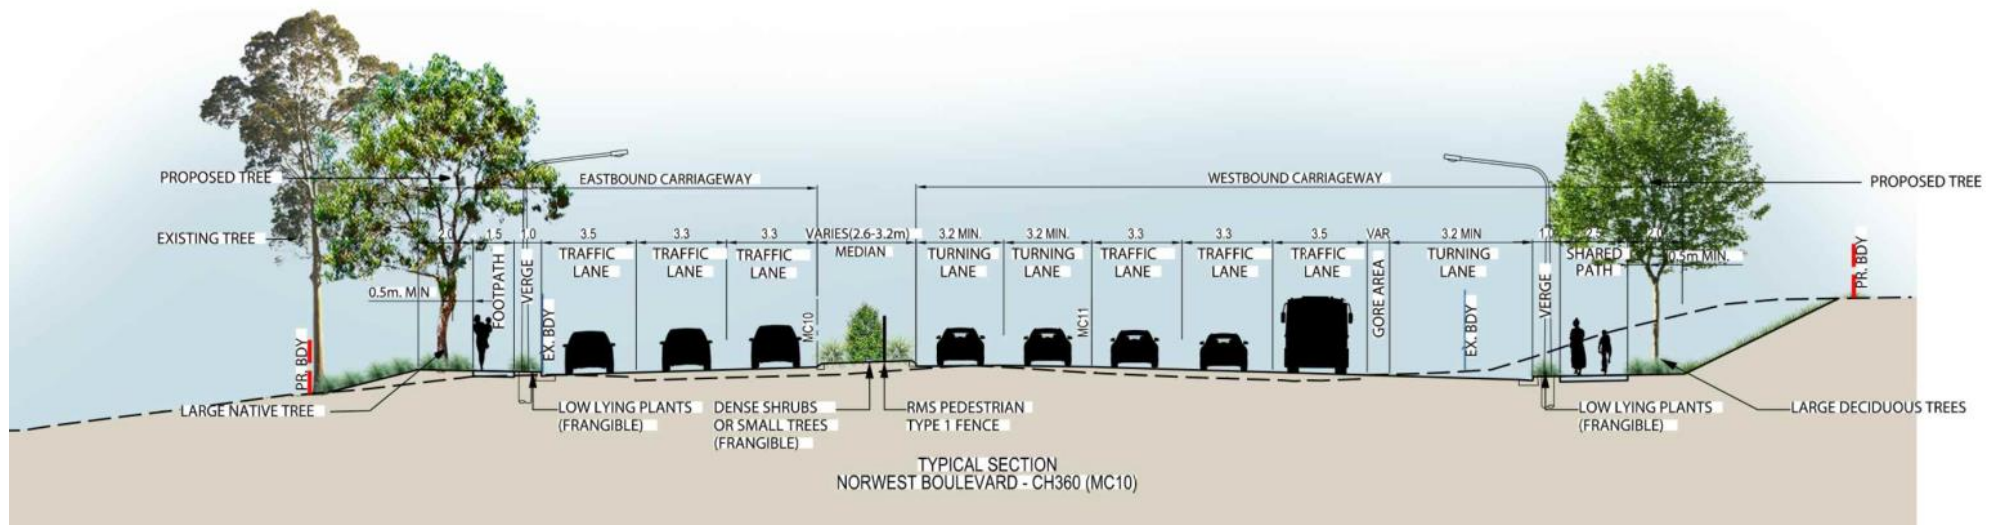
Cross section for Norwest Boulevard (east of the intersection)
